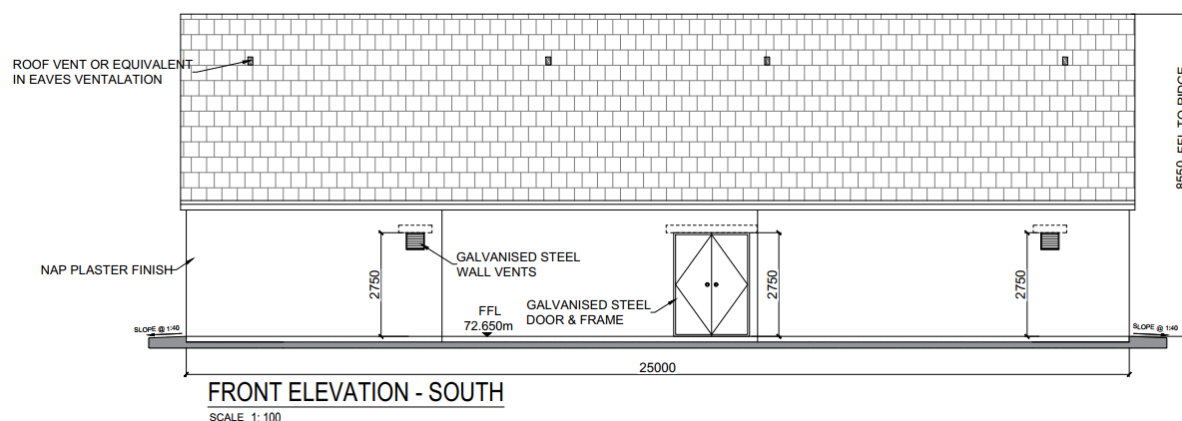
Proposed Substation Building except from Planning Drawing No. 23882-MWP-00-00-DR-C-5423
